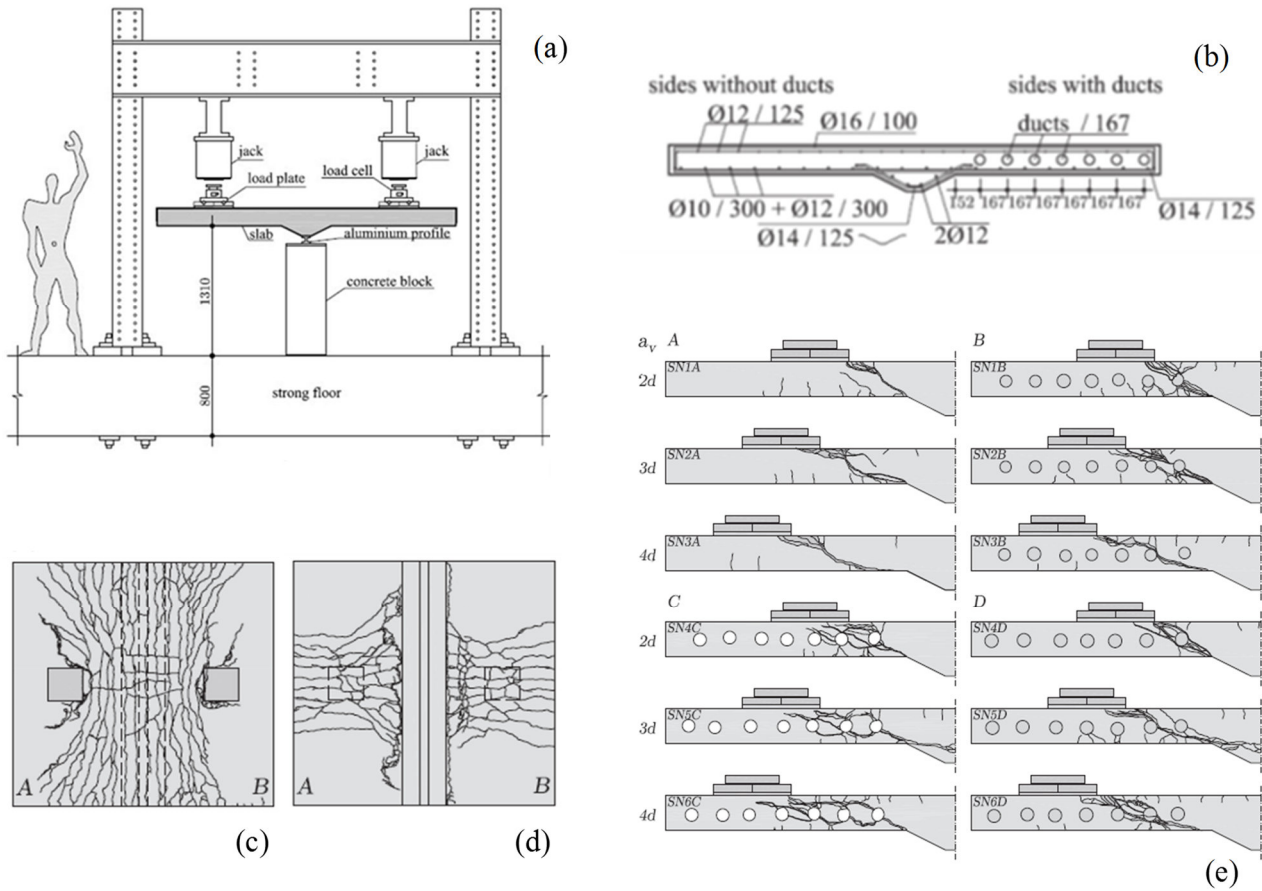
(a) Test set-up for Natario’s experimental campaign; (b) reinforcement layout (measure in mm); (c) crack pattern in the top face of slab SN2A after failure; (d) crack pattern in the bottom face of slab SN2A after failure and (e) cross section of all the specimens [Natario et al., 2014].
